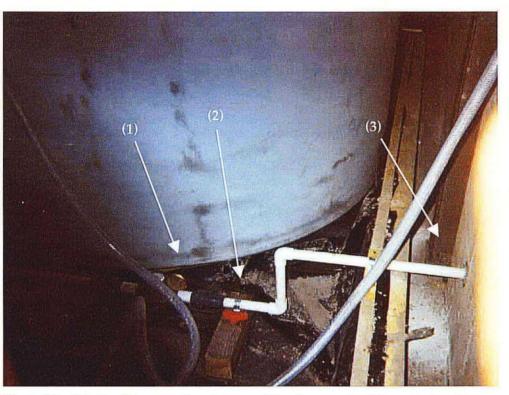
Looking south, picture of the flow meter (1) control valve, (2) and wall junction (3) connecting the indoor and outdoor piping.
